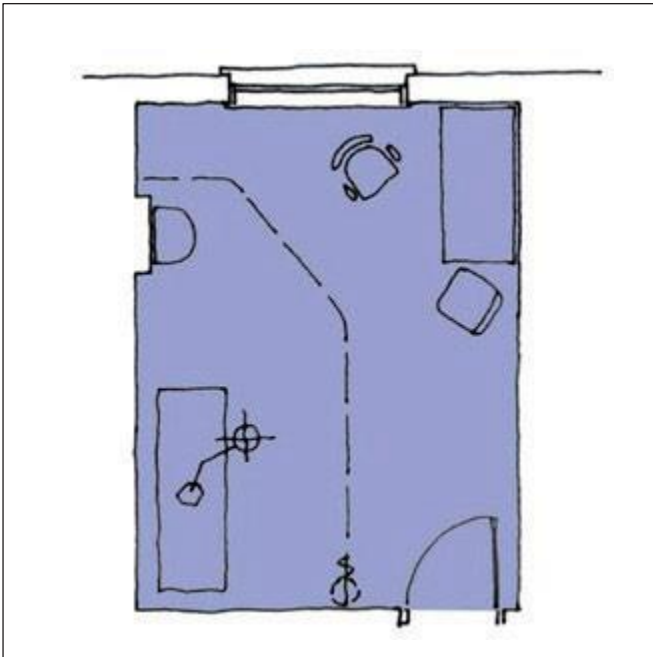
Alternative layout for 16 m² consulting/examination room with couch against wall
